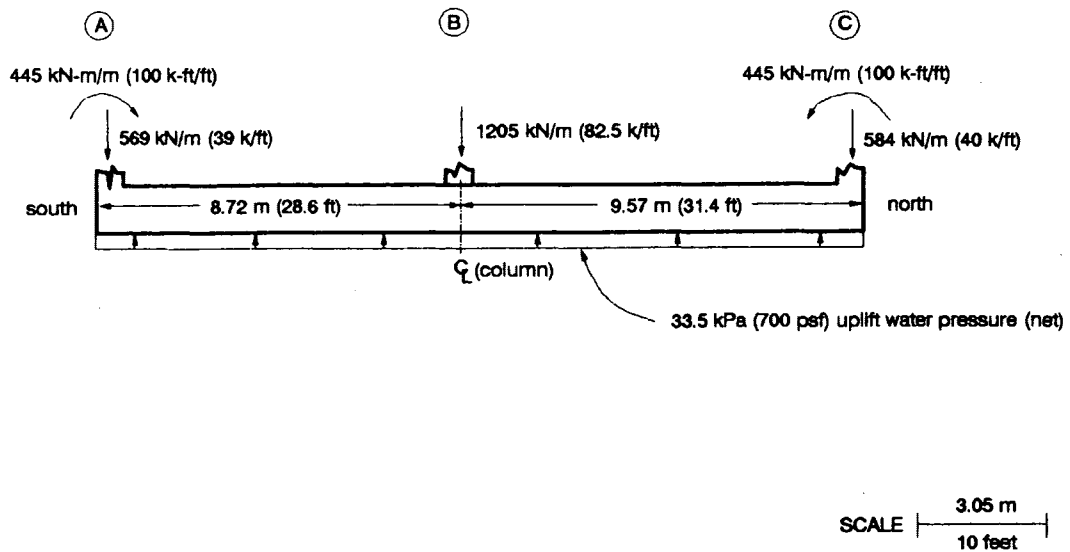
MIT Whitaker Laboratory—Transverse section through mat foundation.
